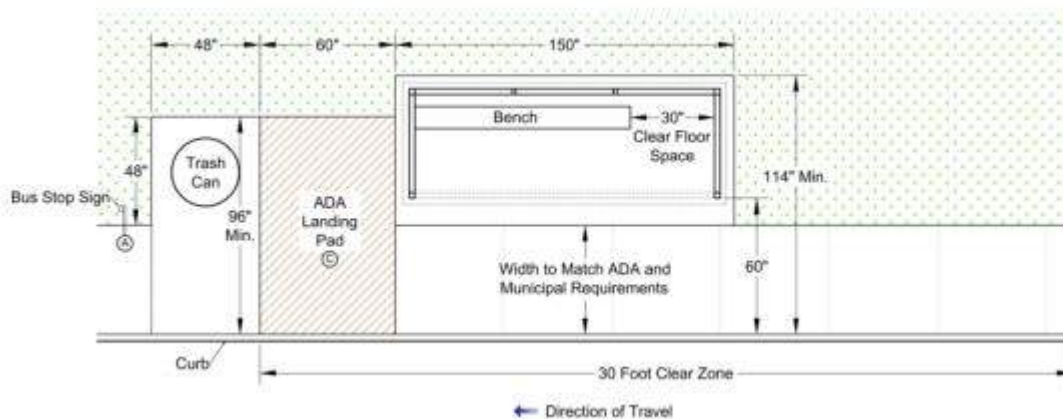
Sidewalk Placed Behind a Bus Stop
